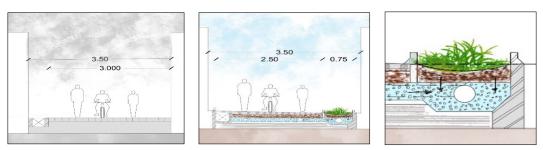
Existing Road Section of Sub-Arterial Roads (Left Image) & Proposed Road Sections for Burst Pipe Road (Right Image)
